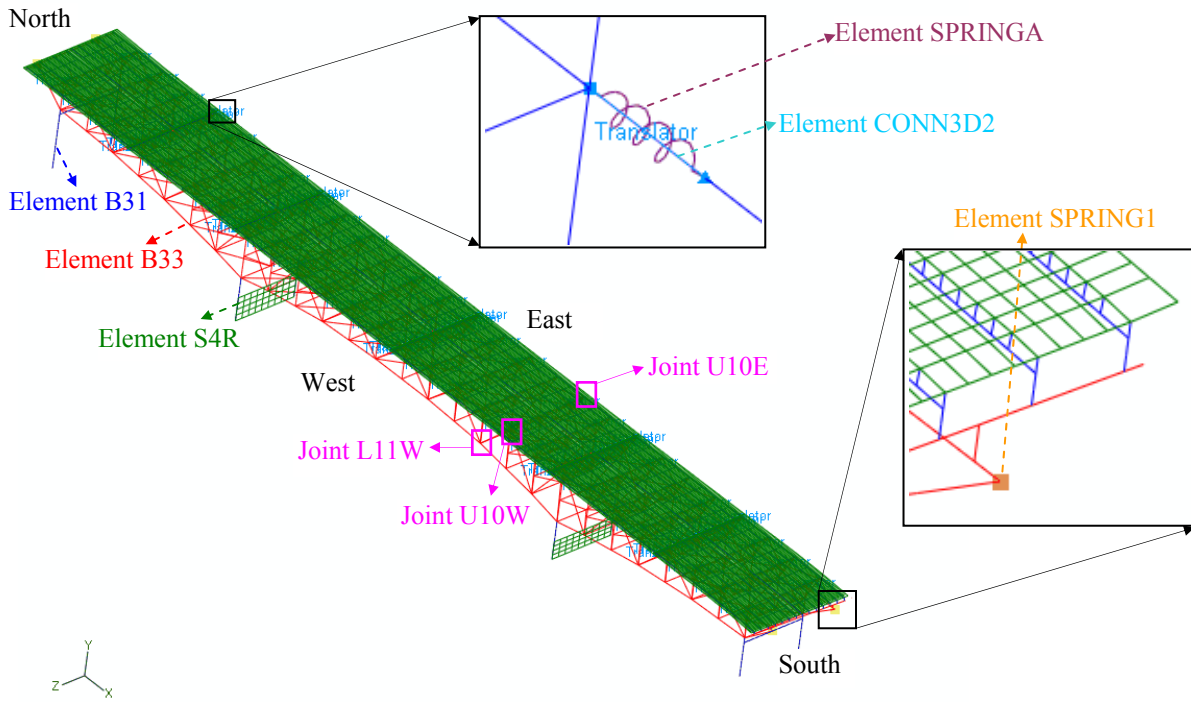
The sixth structural element bridge model provided by FHWA in April 2008
